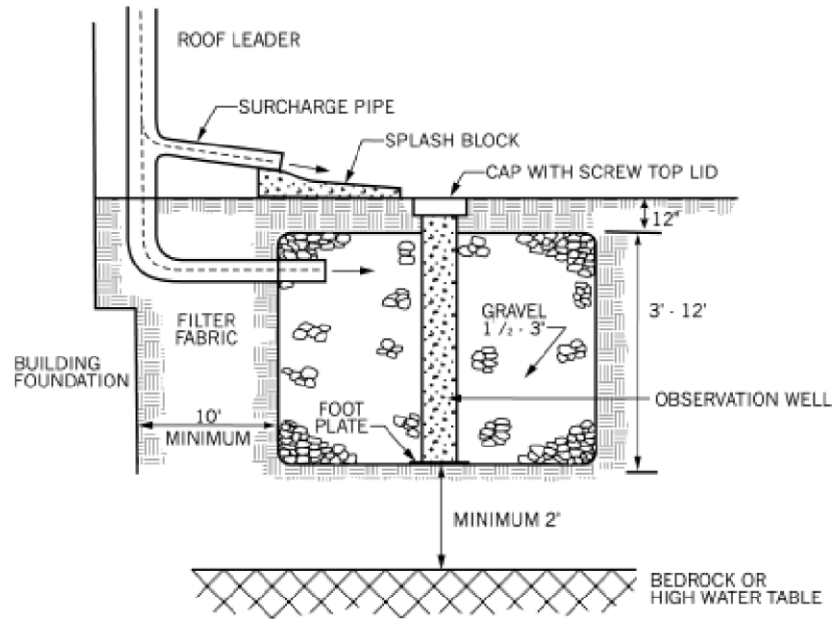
Typical drywell used in Maryland for roof runoff drainage
